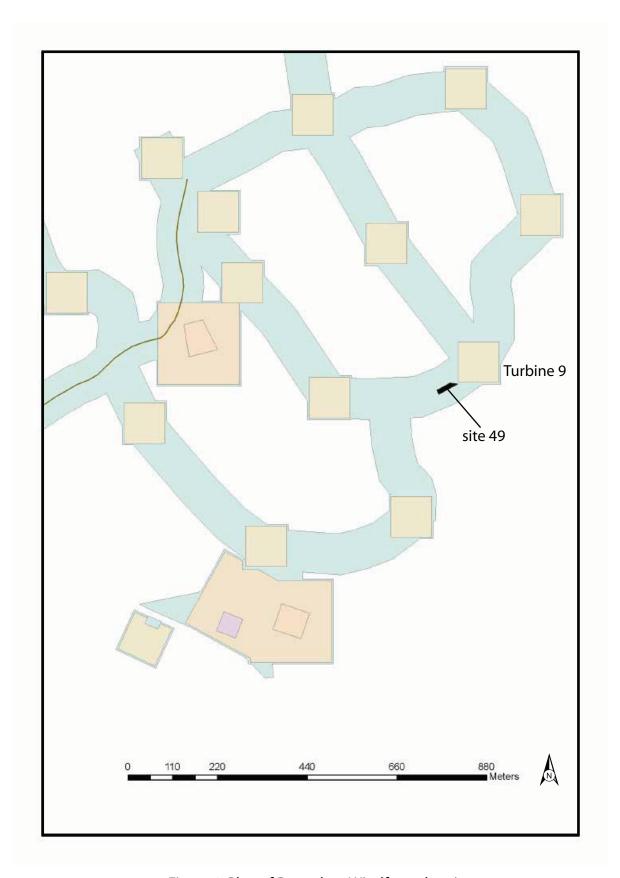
Plan of Drumderg Windfarm showing position of site 49 relevent to Turbine 9
